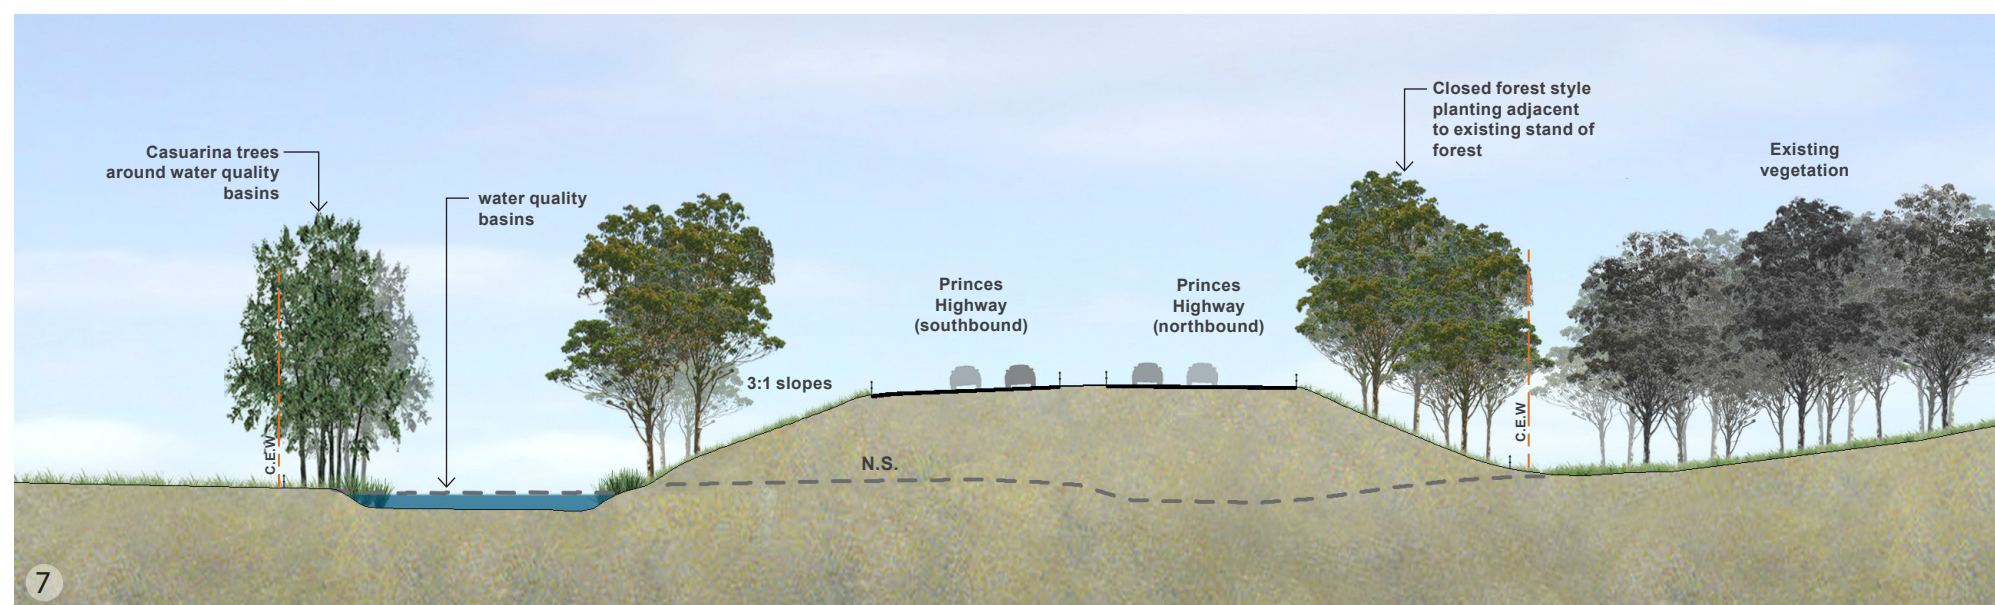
Elevation / Section 7 - North Berry - chainage 13550
